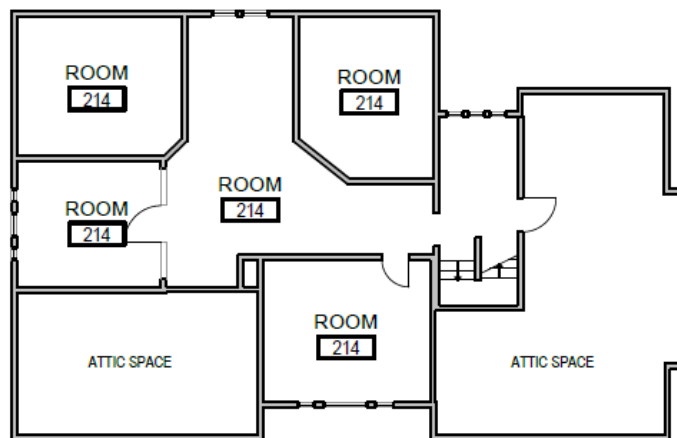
Existing floor plans of Officer's Quarters N. Source: RIM Architects, 2022.
